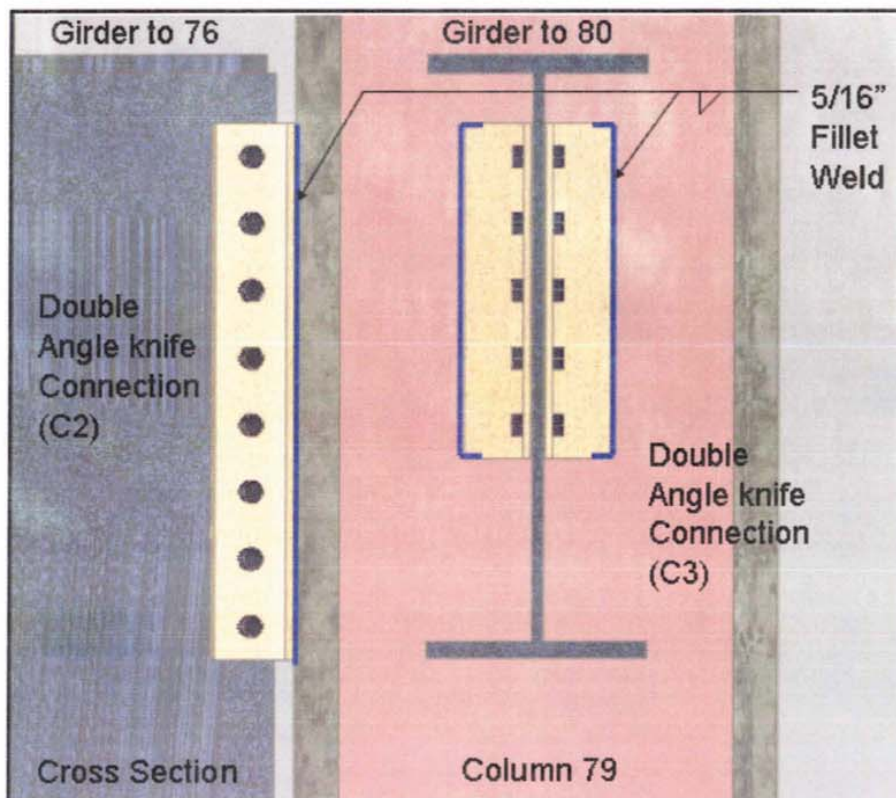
Cross Sectional View of Double Angle Knife Connection at Column 79
